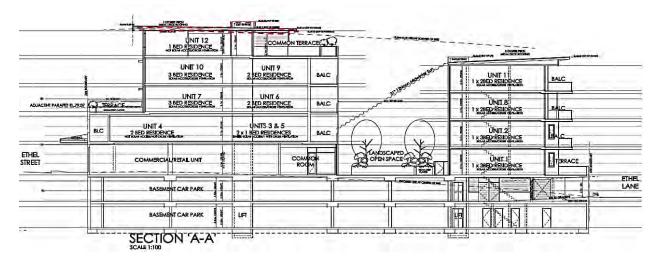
Extract of the Section Plan showing the portion of the roofline of the southern building (outlined in red) which exceeds the maximum permitted building height of 15.5m.
